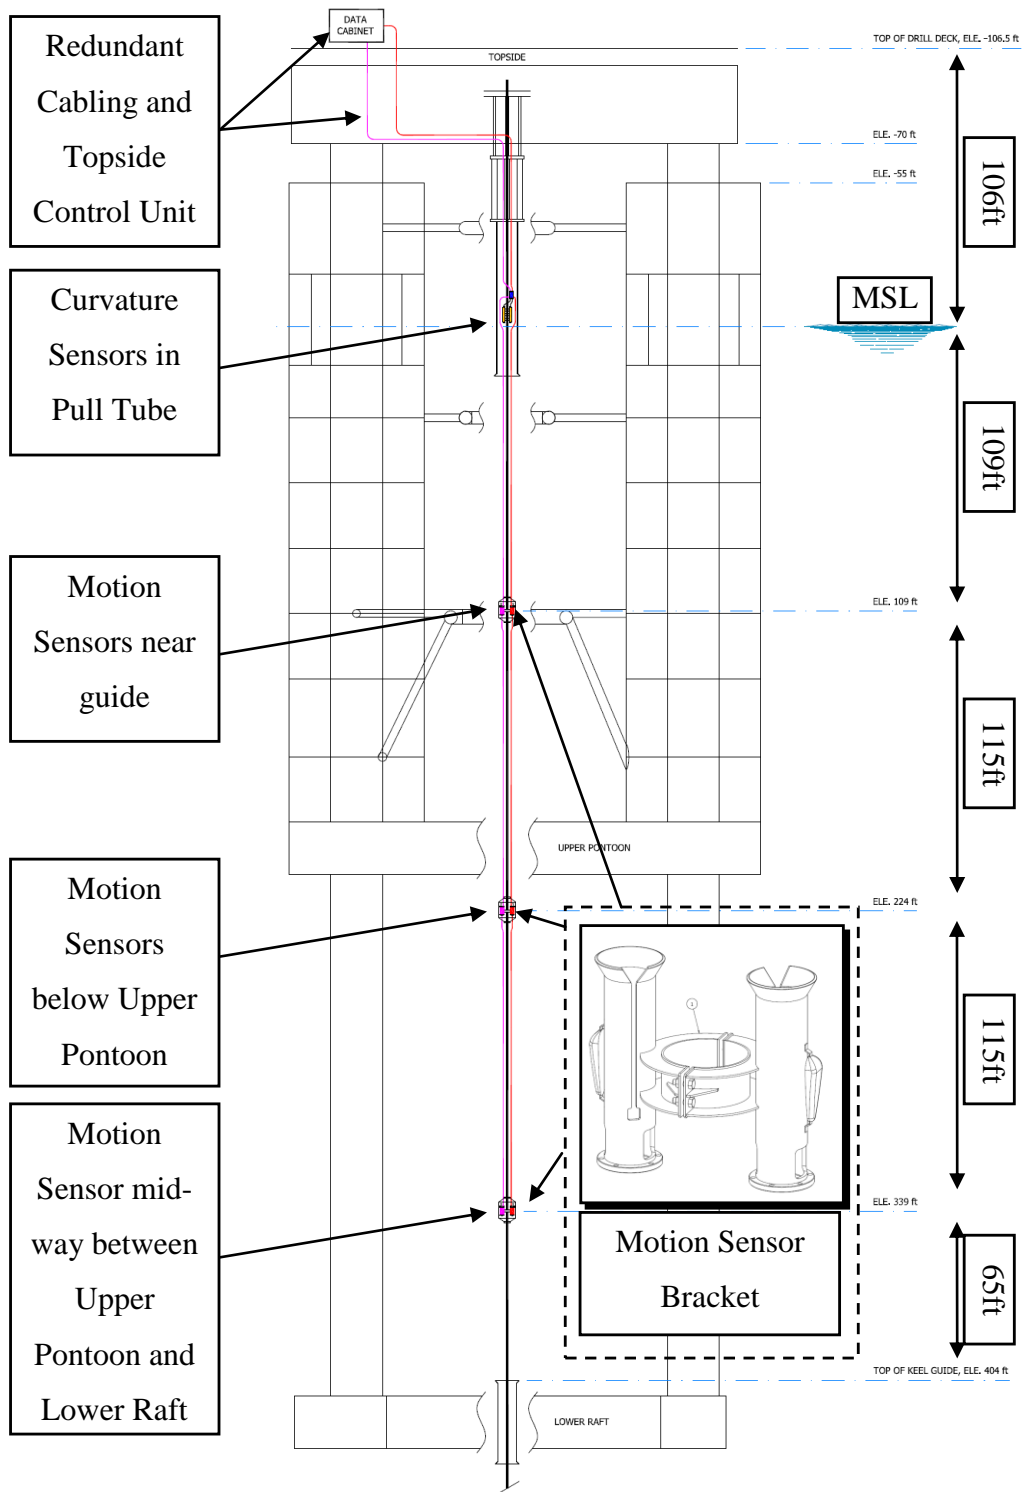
Instrumented Upper Section of Top Tensioned Riser within Spar Super Structure. Dual Motion Sensor Bracket shown inset.
